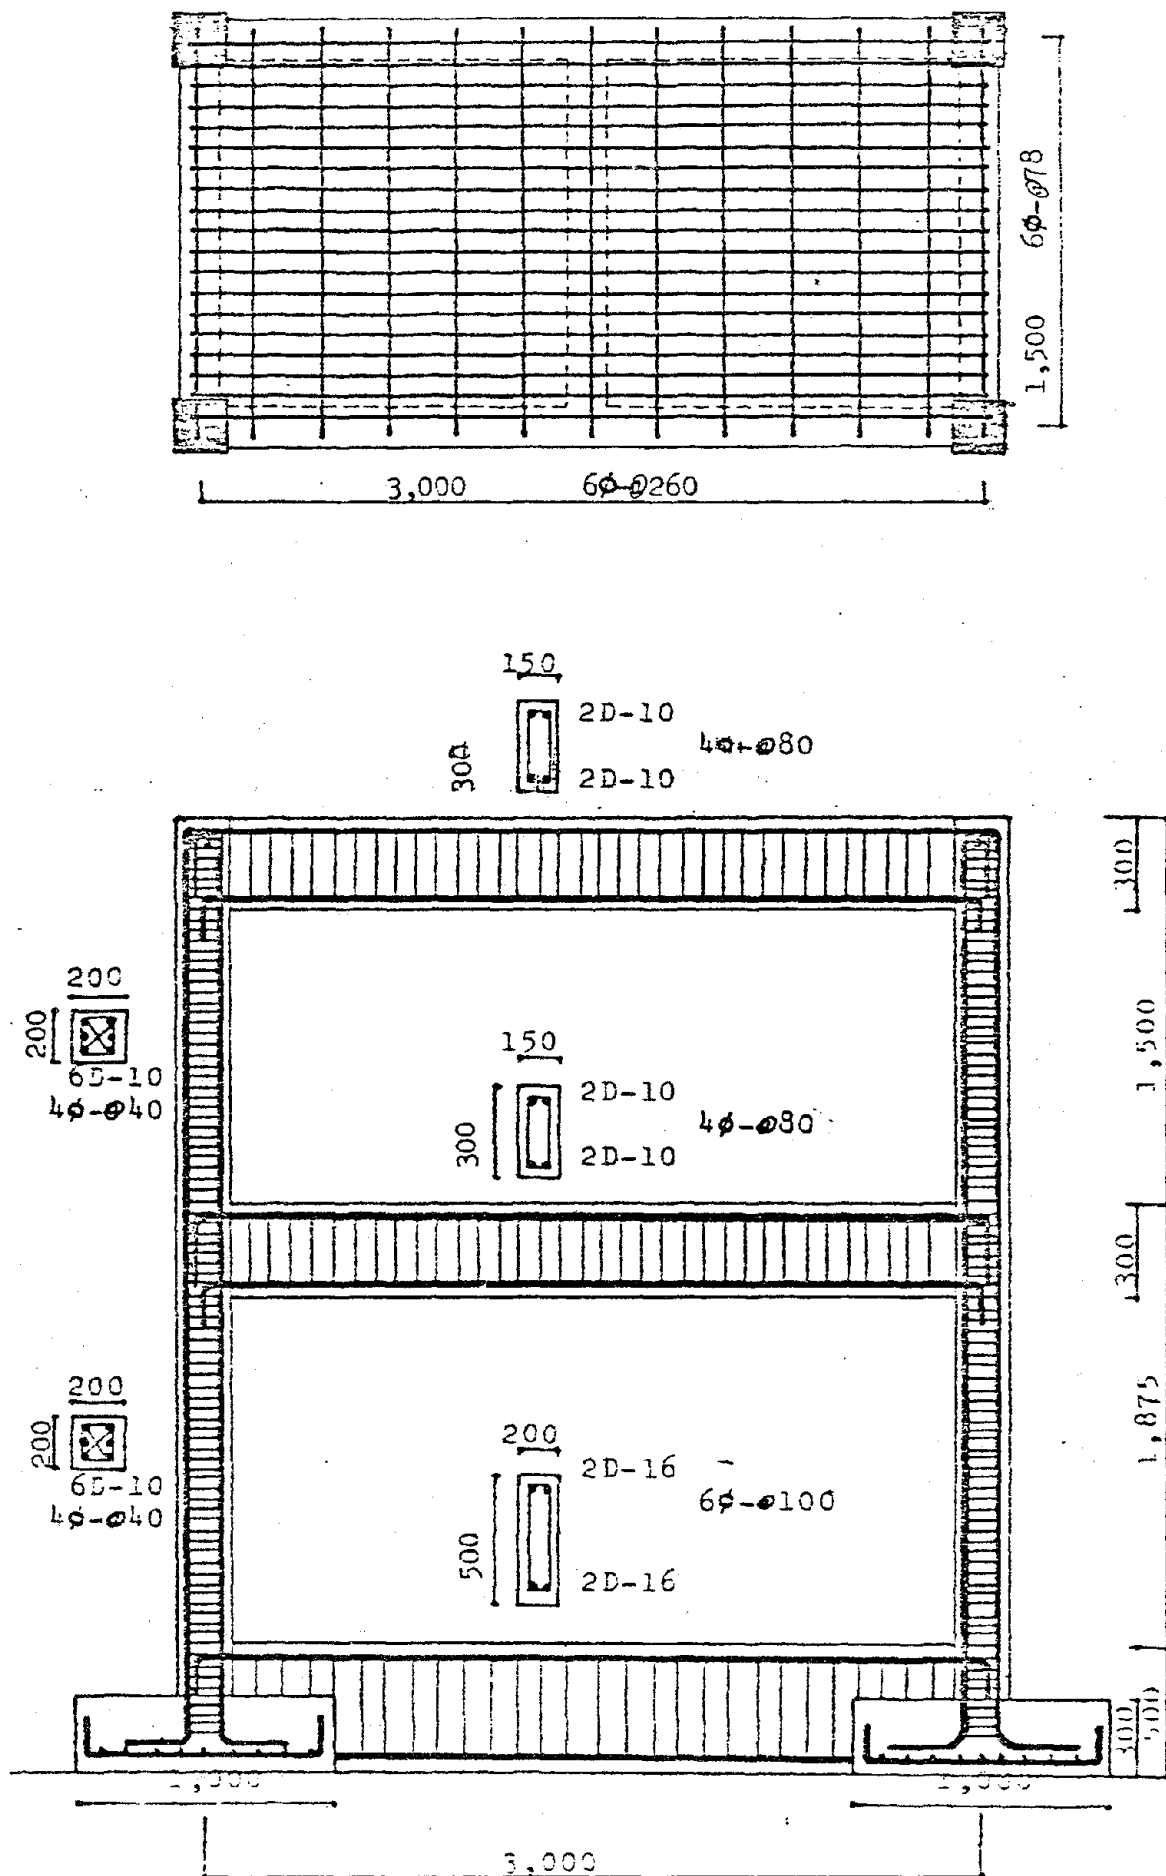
SECTION OF MEDIUM SCALE TEST SPECIMEN
